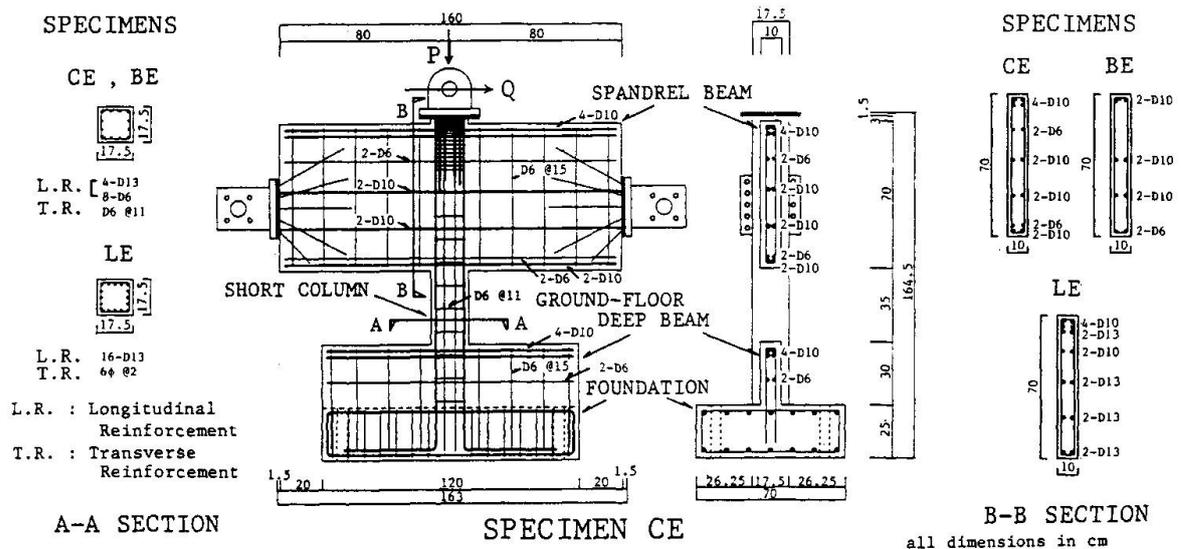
Subassemblage Test Specimen and Cross-sectional Details
